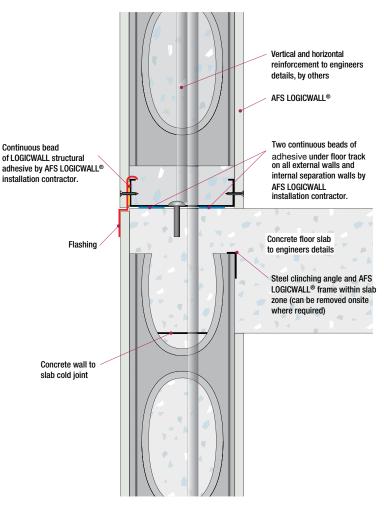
Unfinished Boundary Wall (adjacent to neighbouring building)
